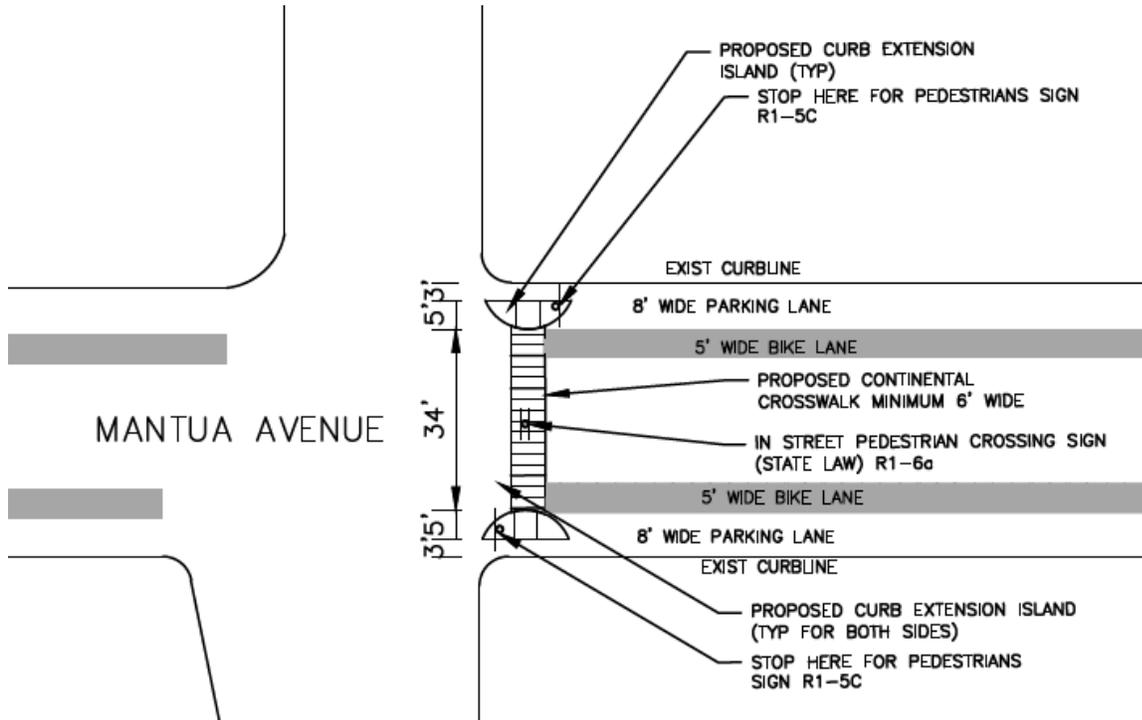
PEDESTRIAN ROAD CROSSING SIGNAGE
